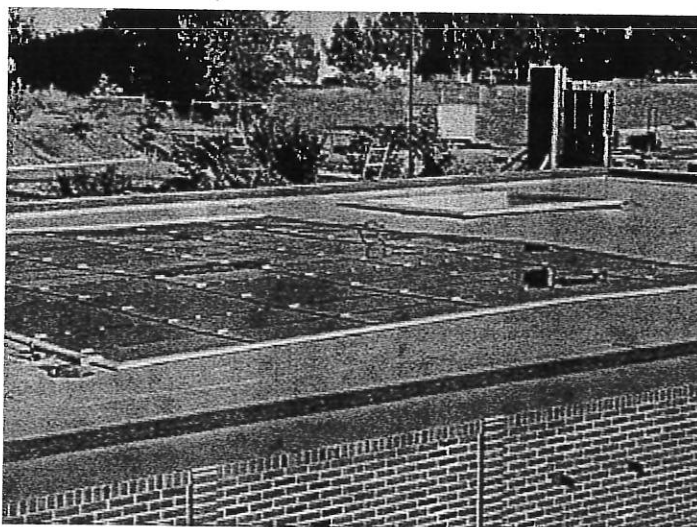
SMUD/WAPA Building Integrated 3 kW PV Roofing System
